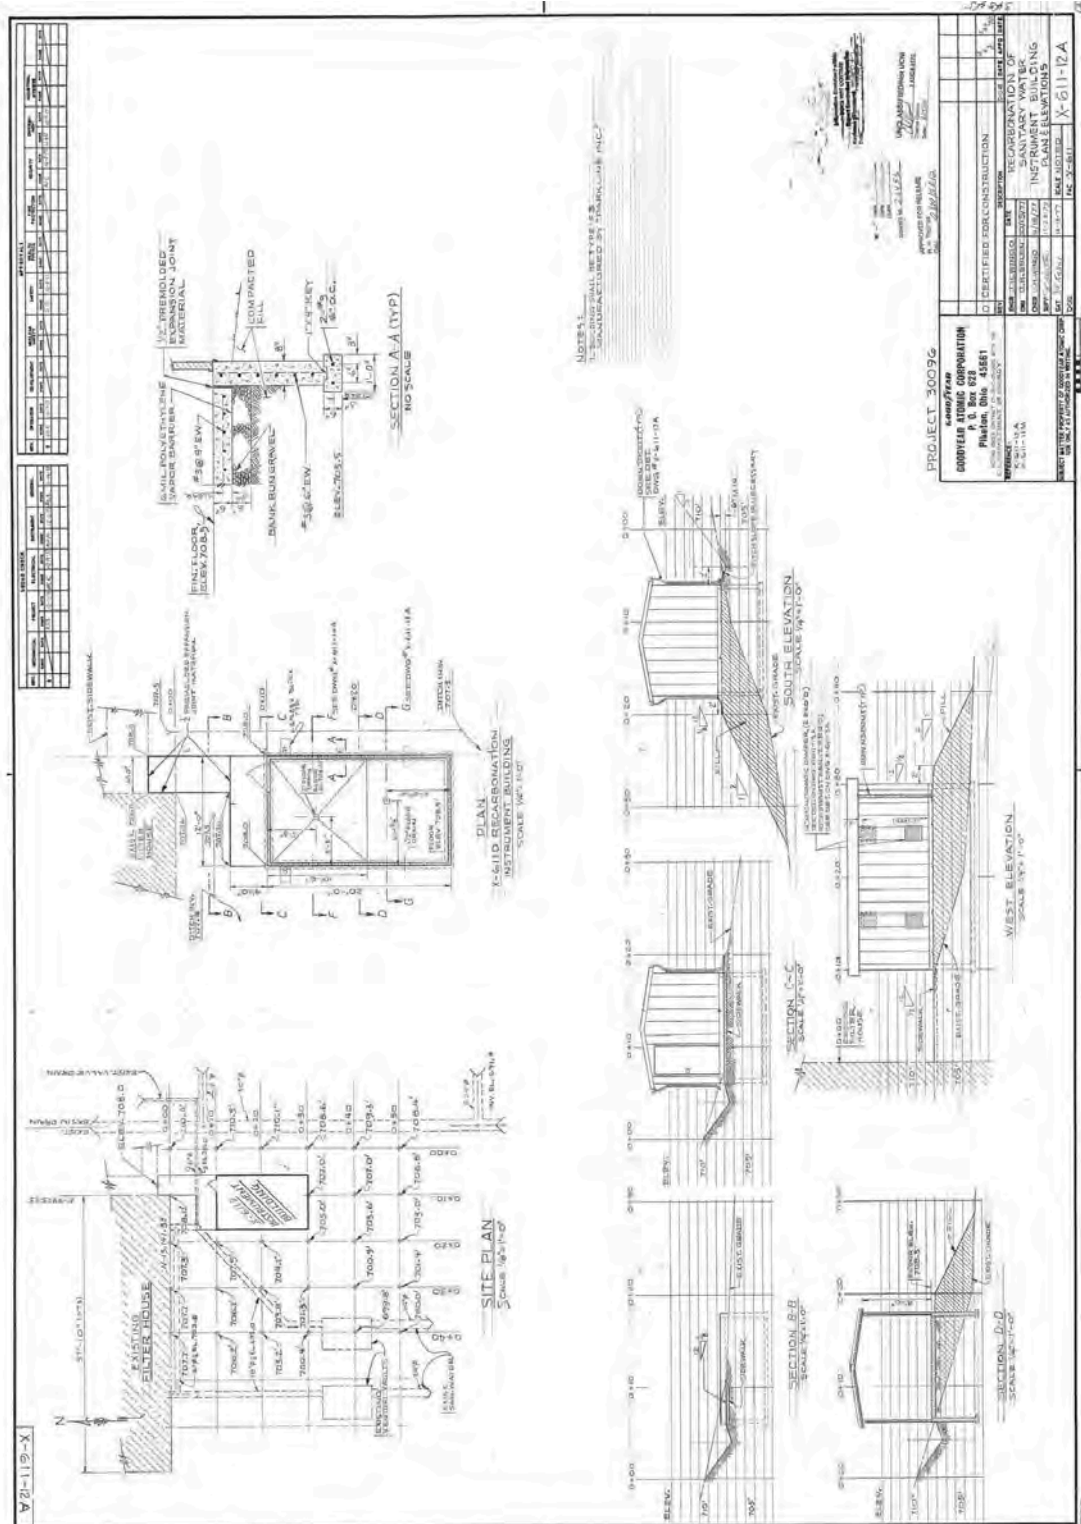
Sanitary Water Instrument Building Plan and Elevations
